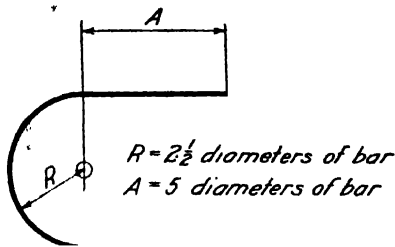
w. Detail of Hook for Reinforcing Bar.
